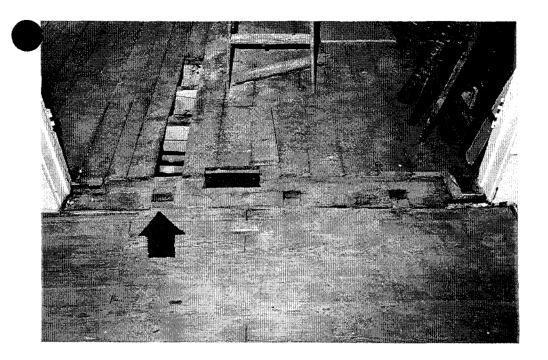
TOP OF SILL BEAM AT EAST WALL OF 1851 COT-TAGE
